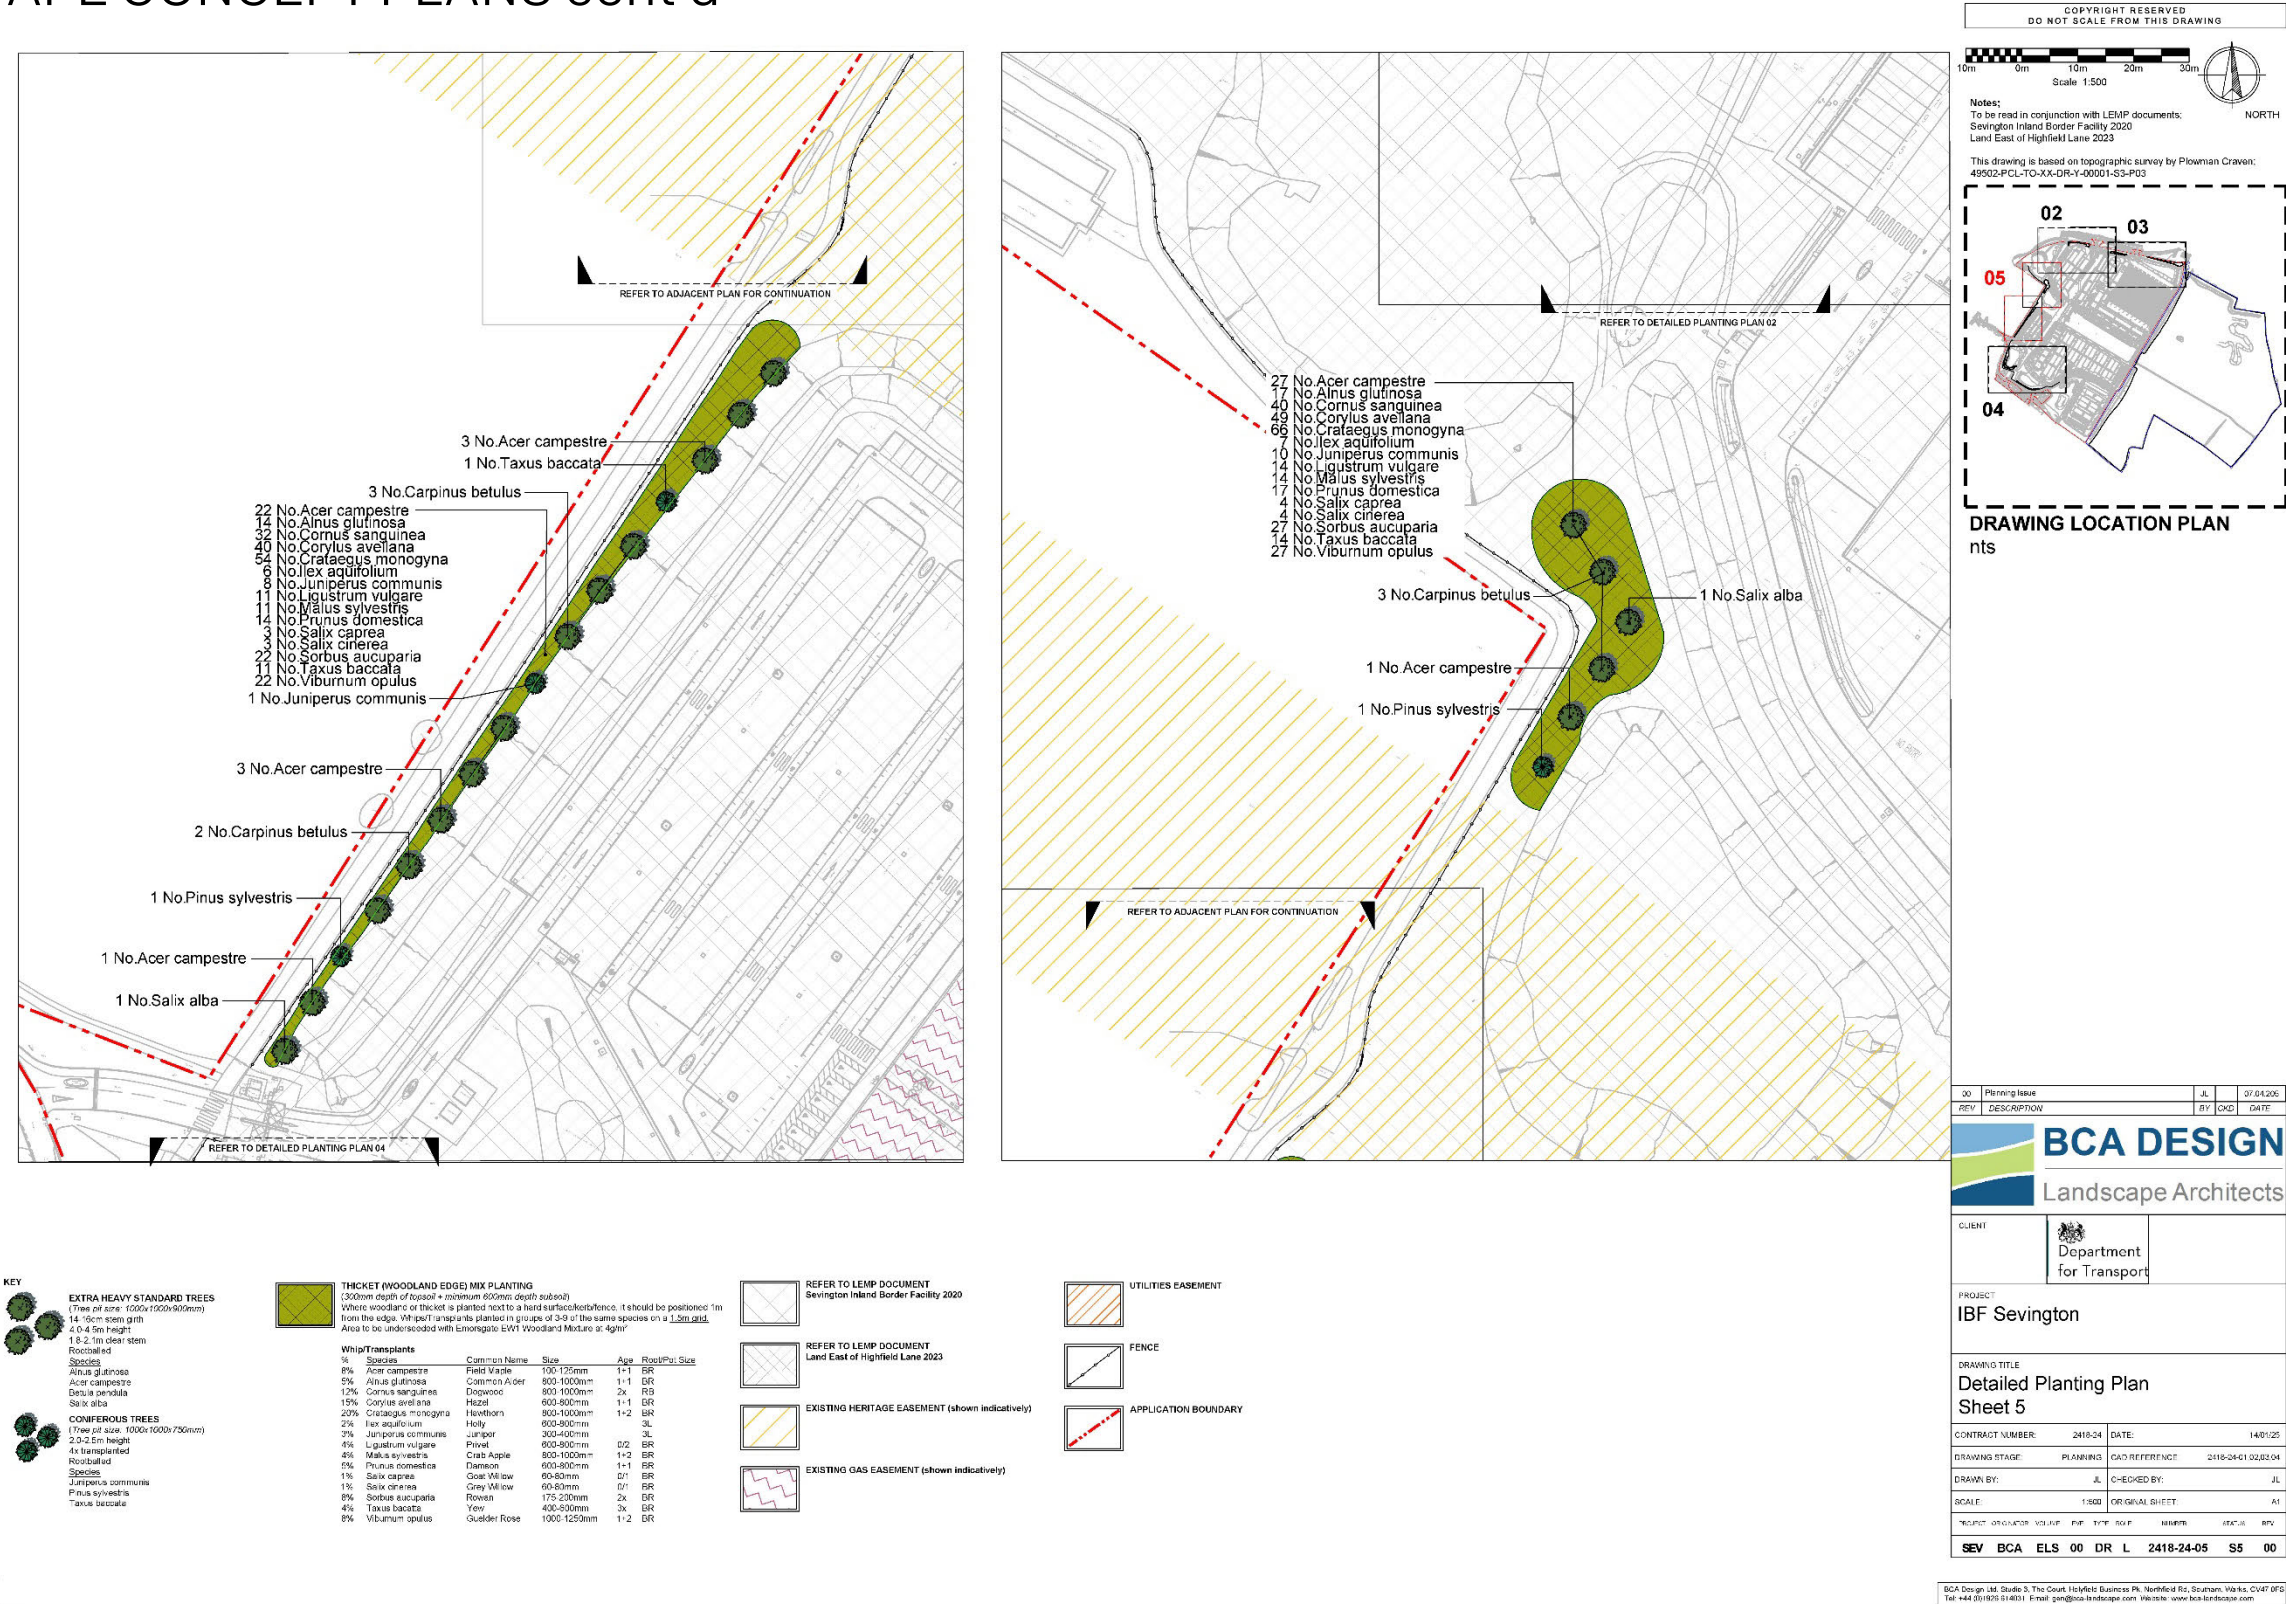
2418-24-05 Landscape Detailed Planting Plan Sheet 5
